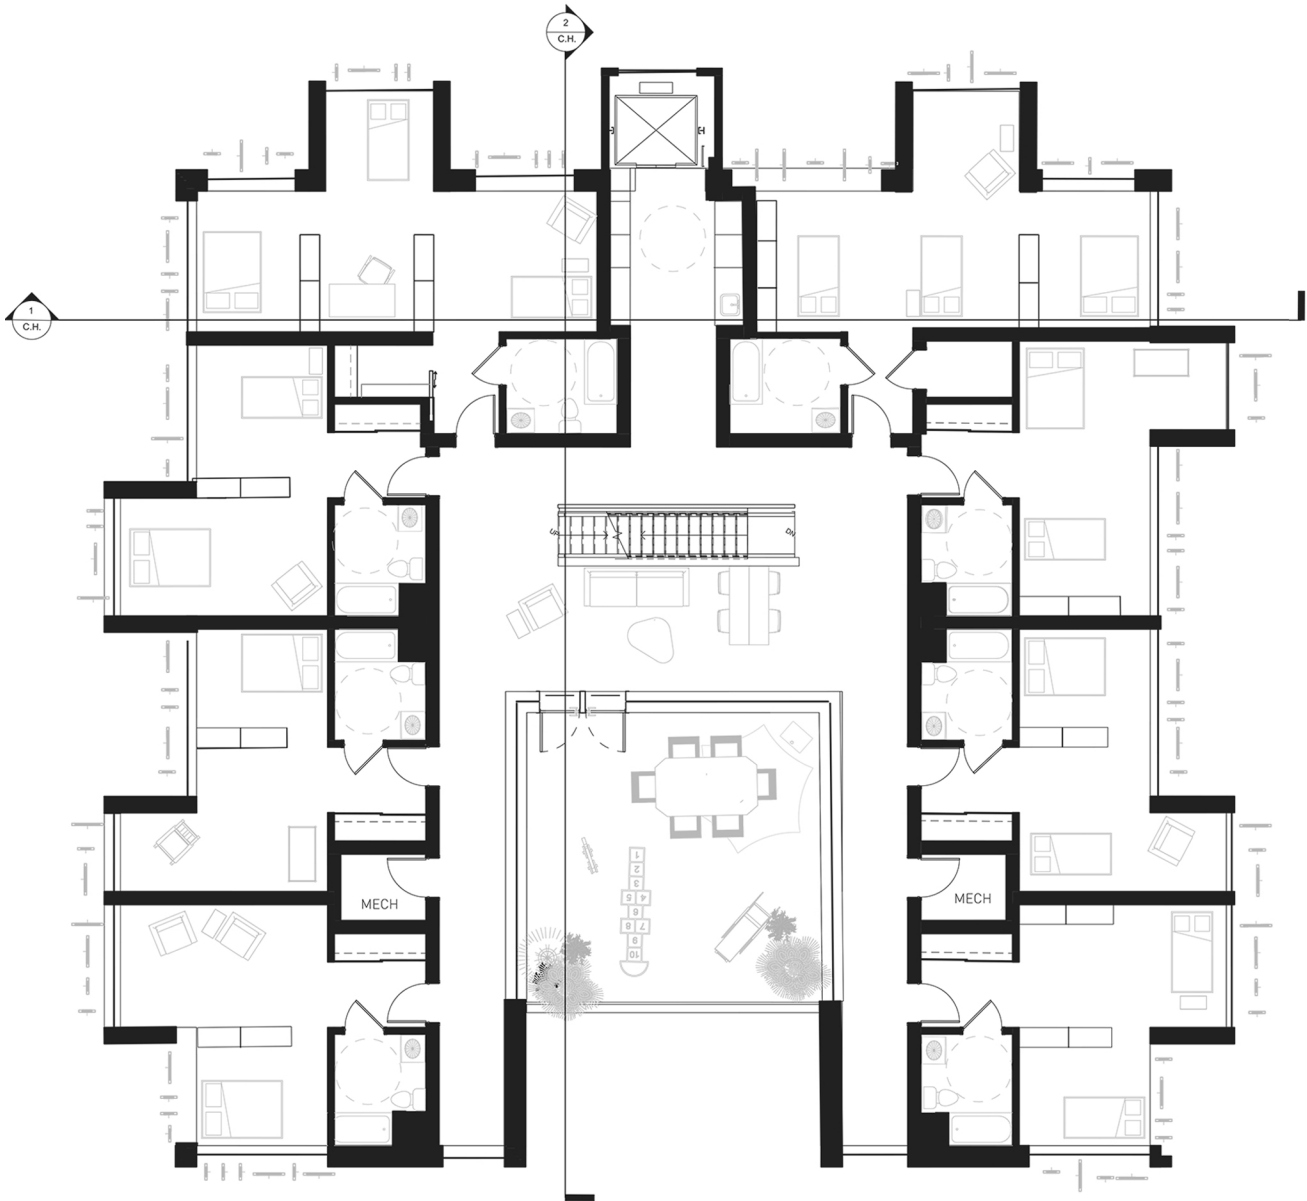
Author, *Proposed Women's Transitional Cohousing Second Floor Plan 1:175*, 2019.
